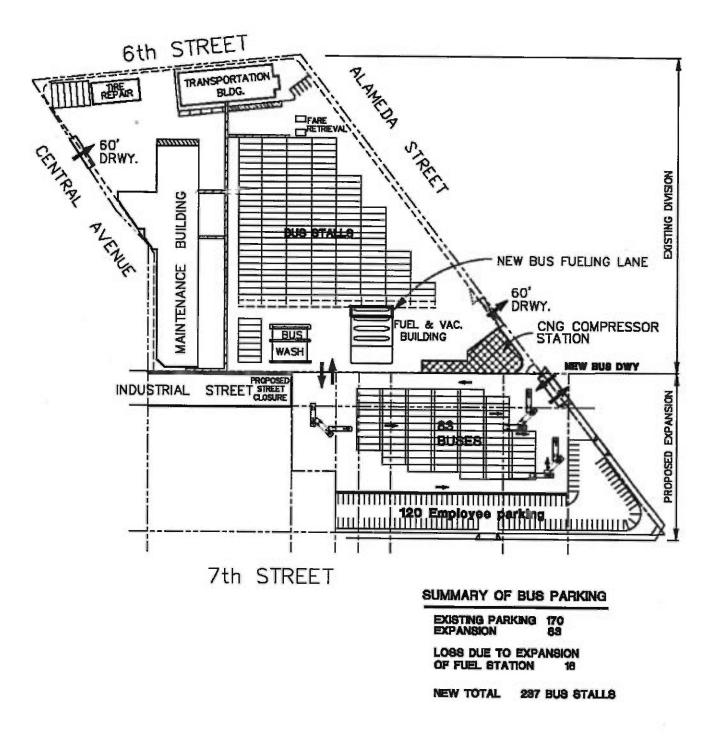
Site Plan It is estimated that project construction would occur for three months. Approximately 10 construction workers would be required to complete the proposed project. It is anticipated that approximately 120,000 square feet (~2.75 acres) of land (proposed acquisition area and a portion of Industrial Street) would be minimally disturbed during site clearance, limited grading, and site paving.
